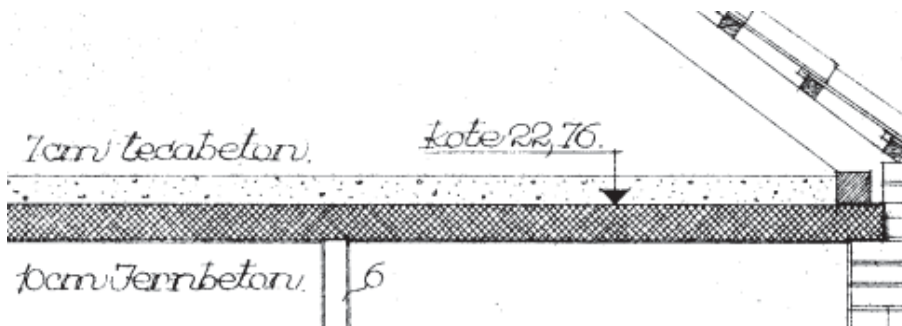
Horizontal partition towards the attic room. From the top: Thermal insulation consisting of Leca concrete, reinforced concrete and a layer of plaster.
